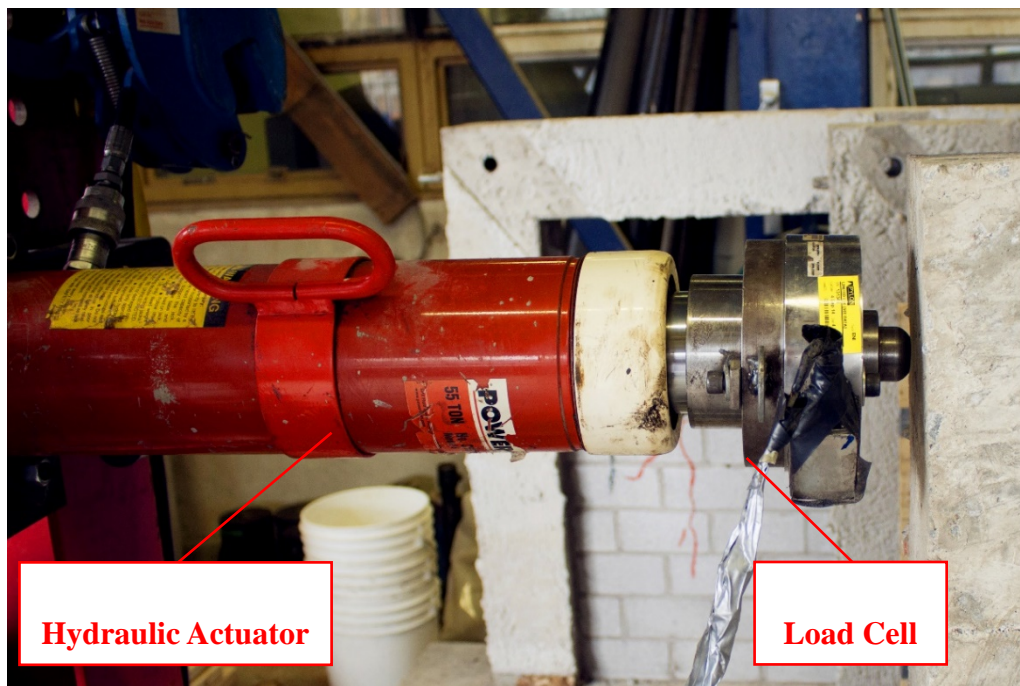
Hydraulic Actuator Connection to Test Specimen
